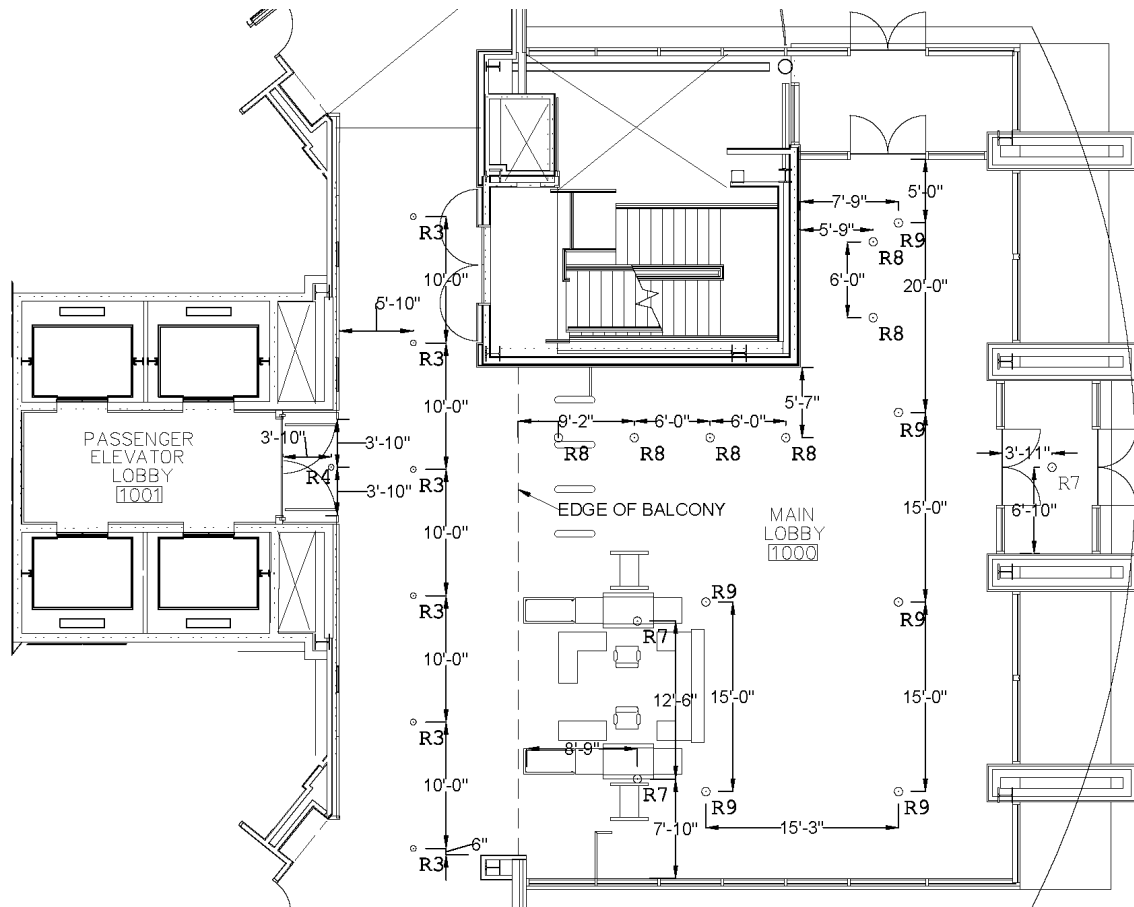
Main Lobby 1000 Upper Level Reflected Ceiling Plan
